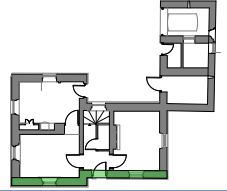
Elevation A. First Floor Sliding Sash Windows.
